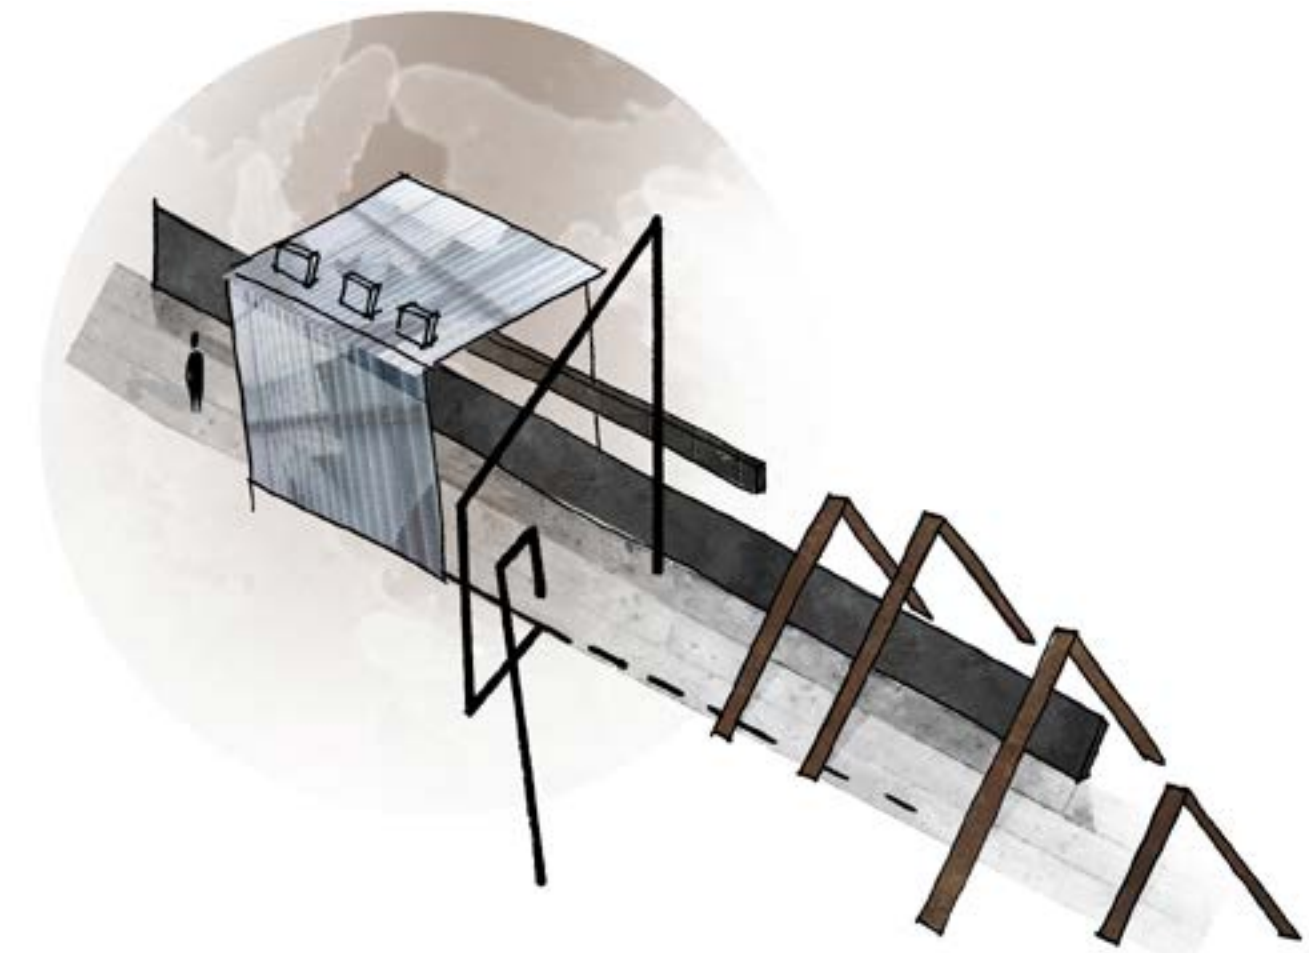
B: Architectural approach to frame structure (Author, 2021)
